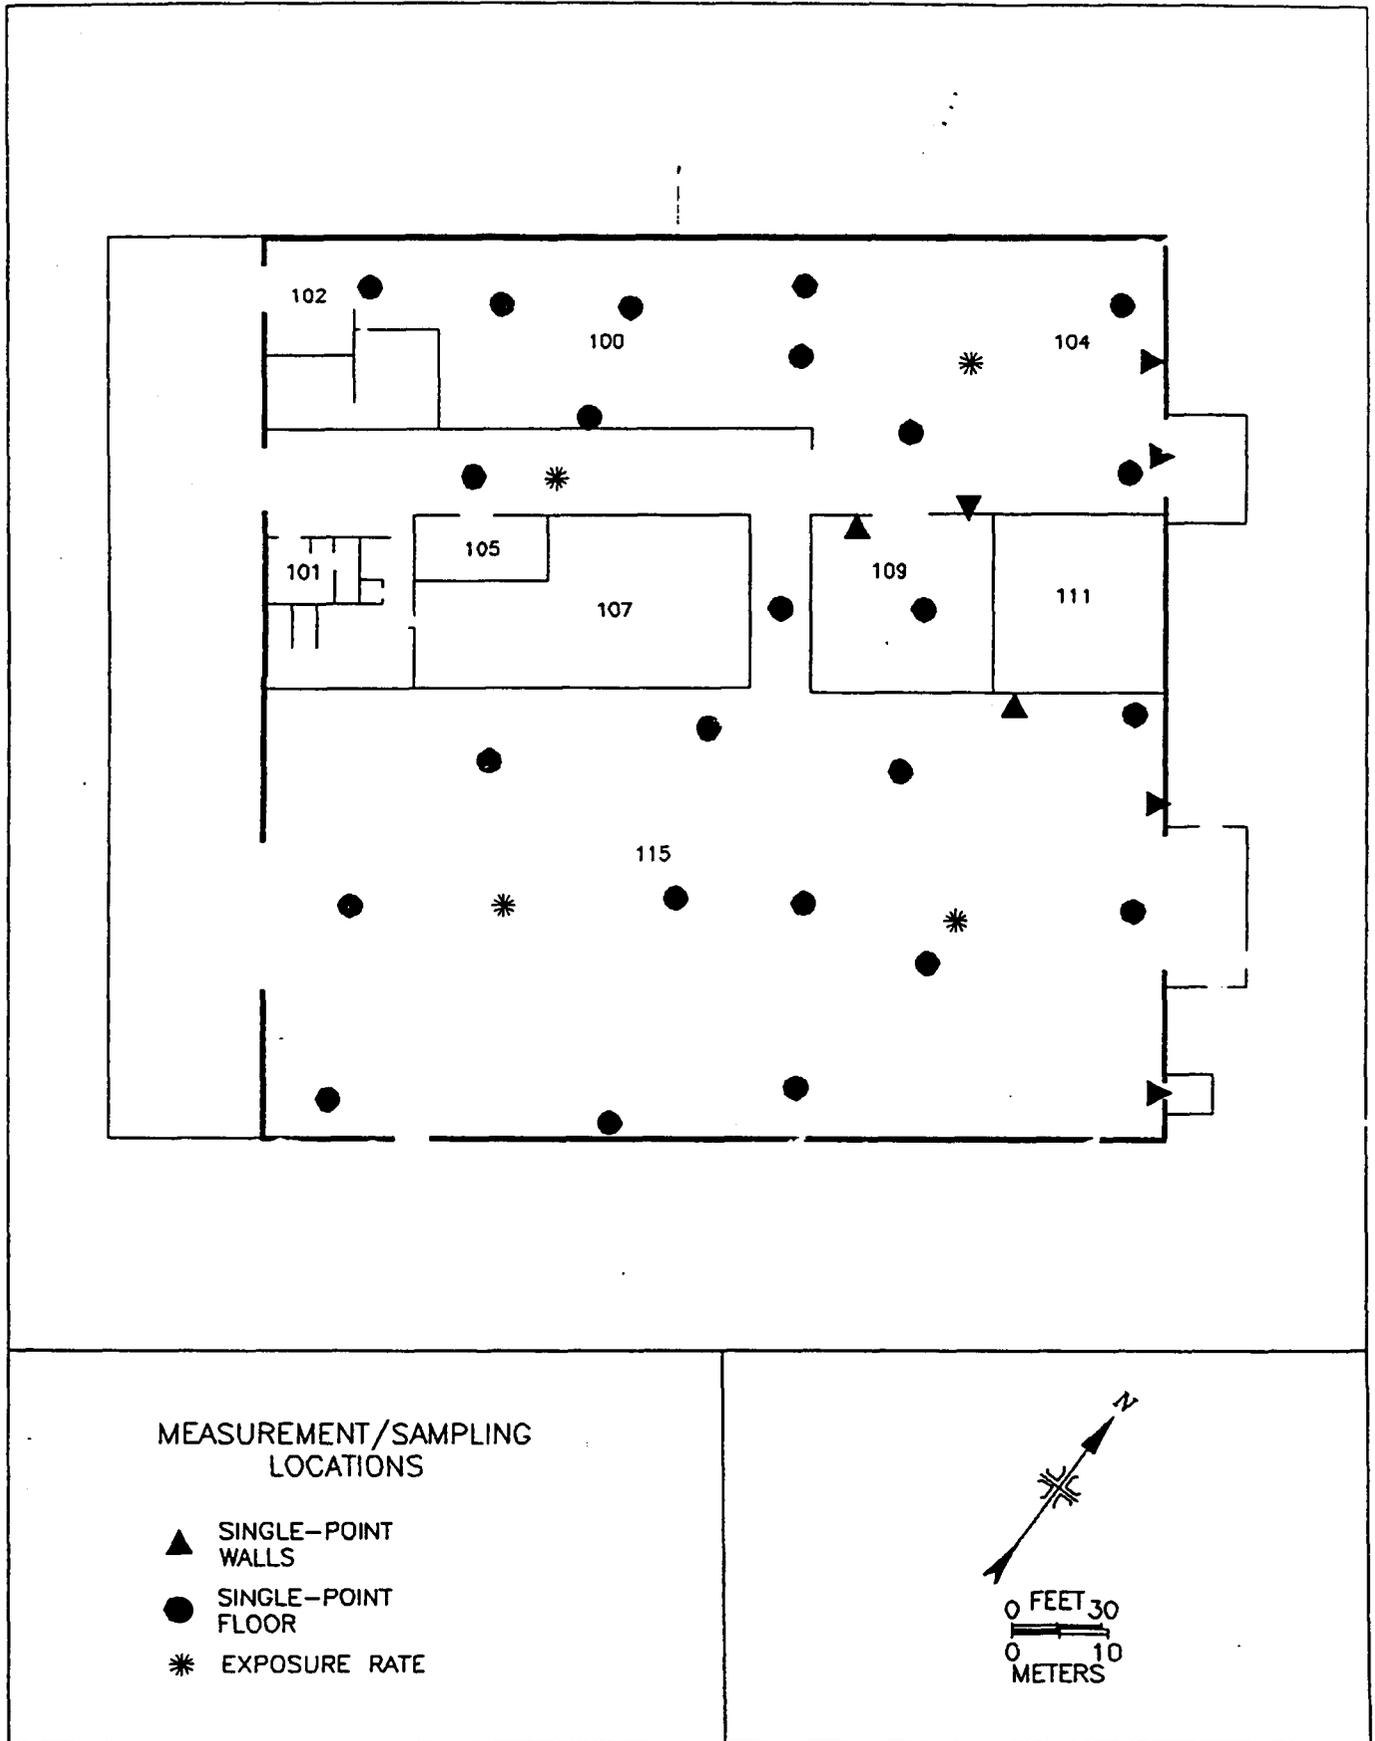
Building T013 – Floor Plan and Measurement and Sampling Locations
